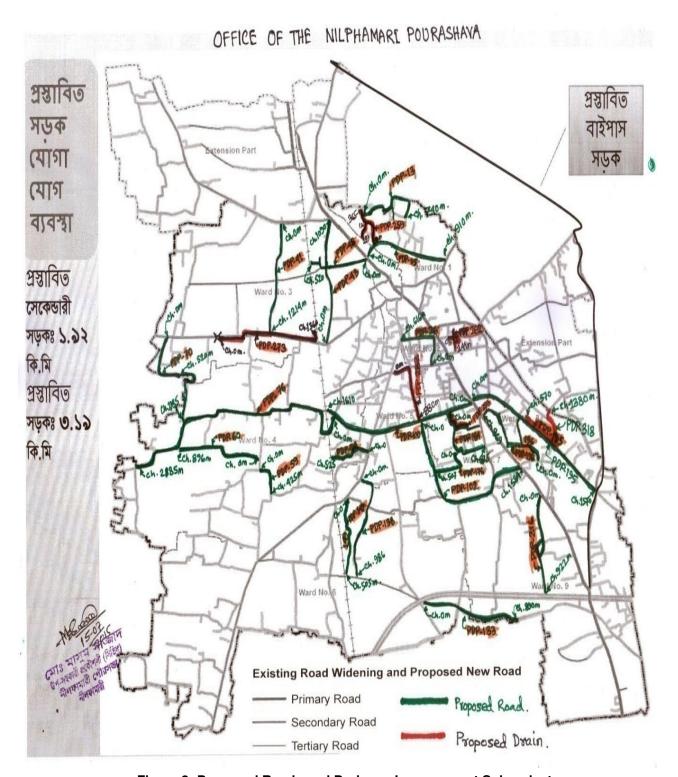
Proposed Roads and Drainage Improvement Subprojects
